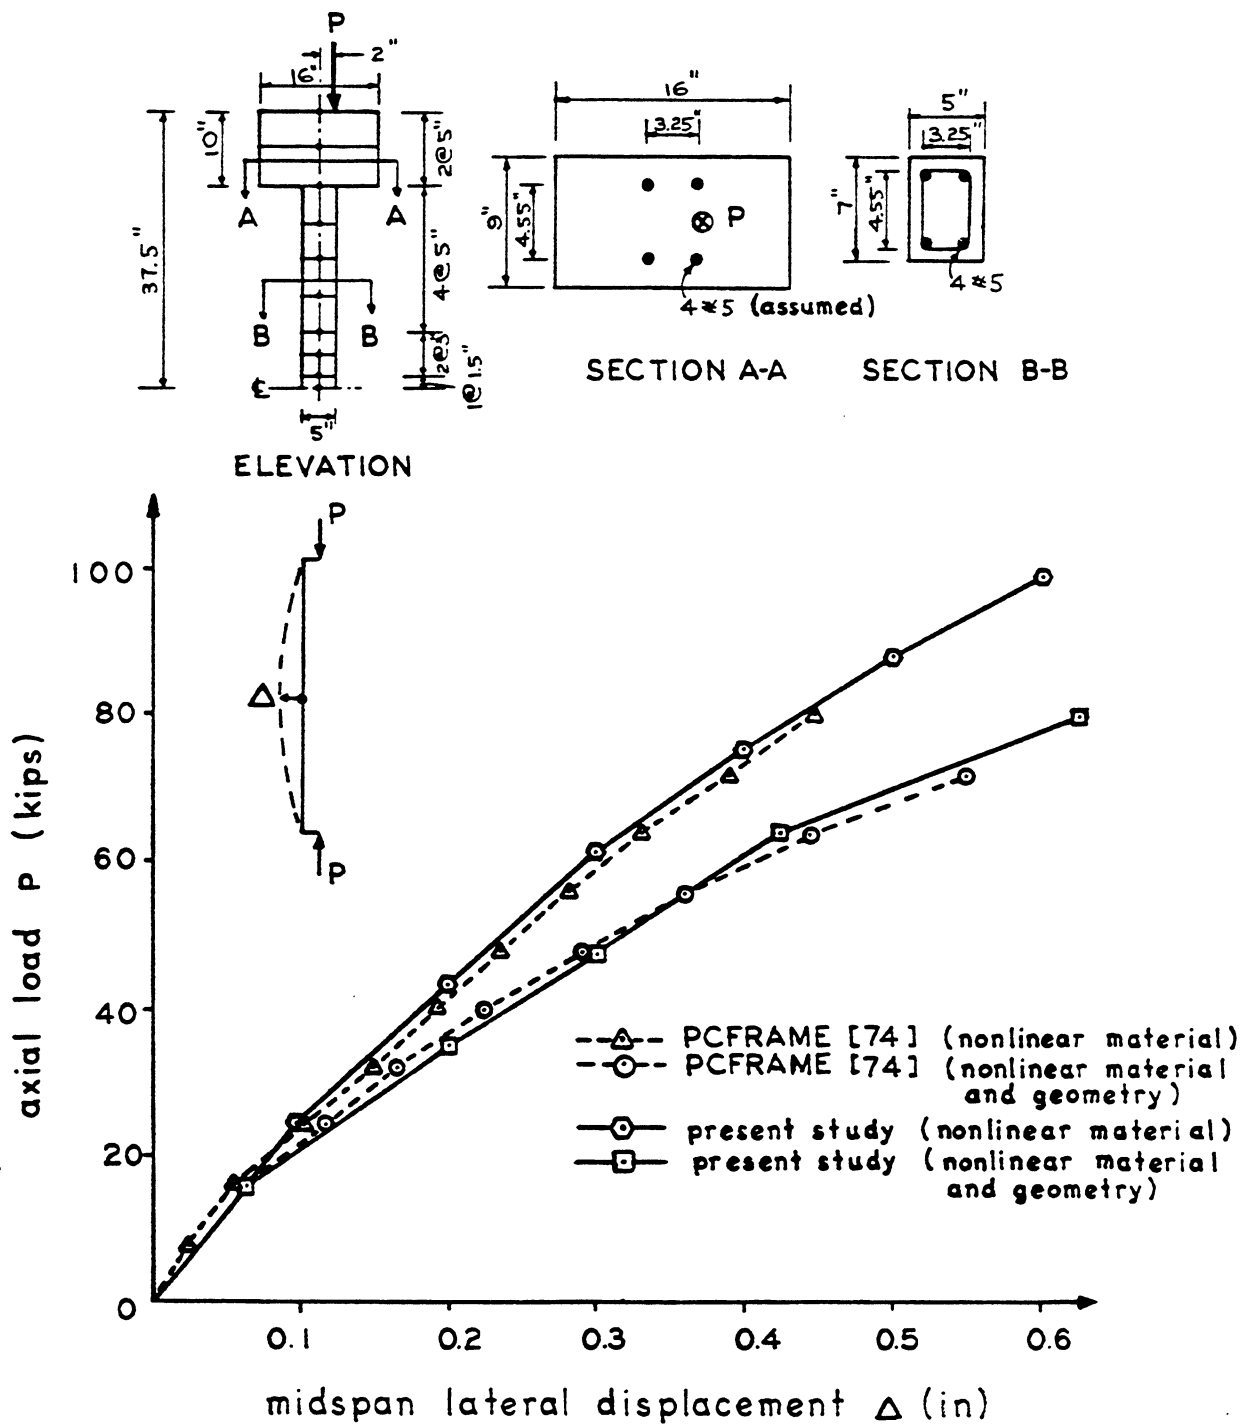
SHORT TIME LOADING ON A REINFORCED CONCRETE COLUMN (EX. 10.3.3) - LOAD VS. MID-SPAN LATERAL DISPLACEMENT
